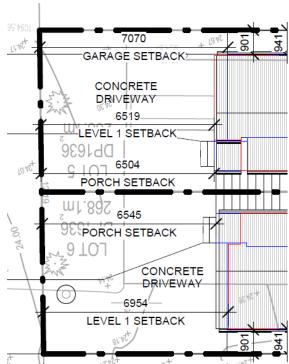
Extract of the architectural plans (Site Plan) showing the proposed hallway located 800mm from the common lot boundary
